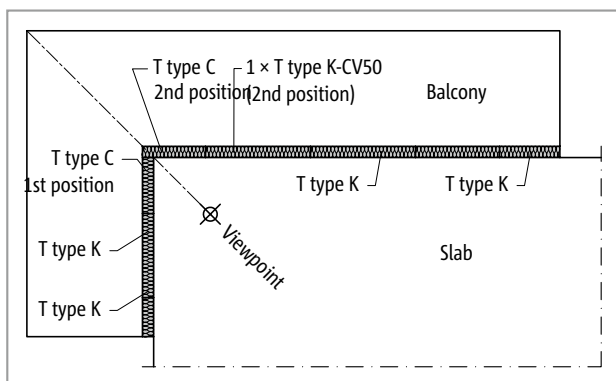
Schöck Isokorb® T type C: Balcony with outside corner freely cantilevered
